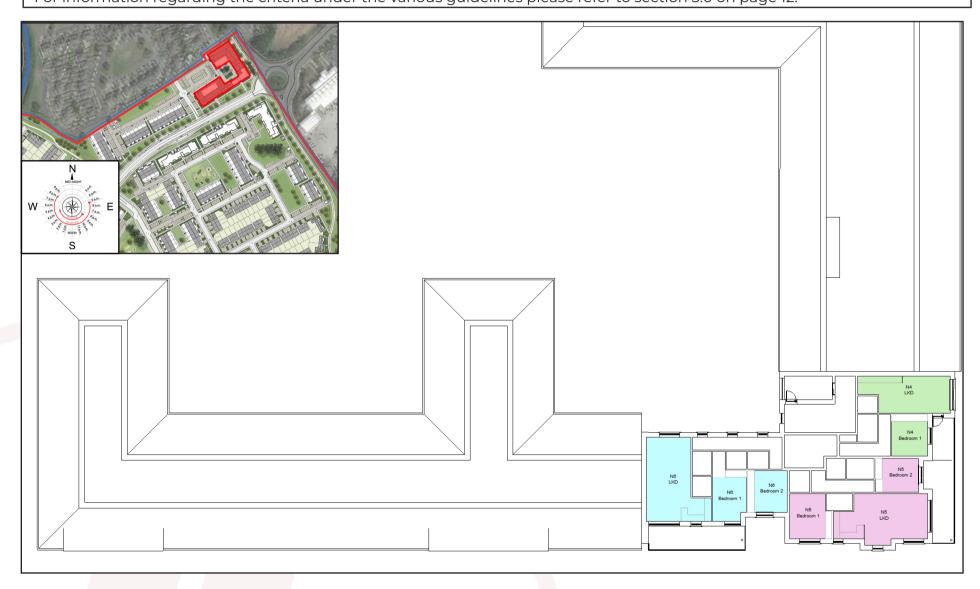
Floor plan of assessed building (Below), Keyplan highlighting the assessed building (Above).
